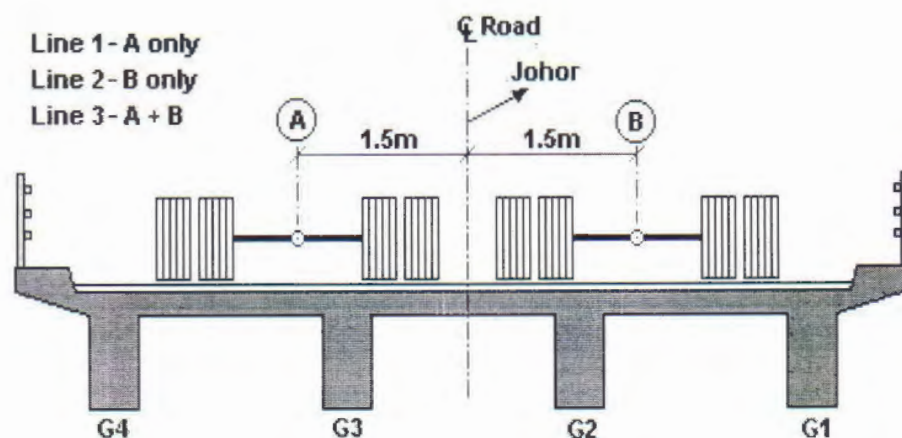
Example of transverse position of test truck: Bridge FT001+149.2
